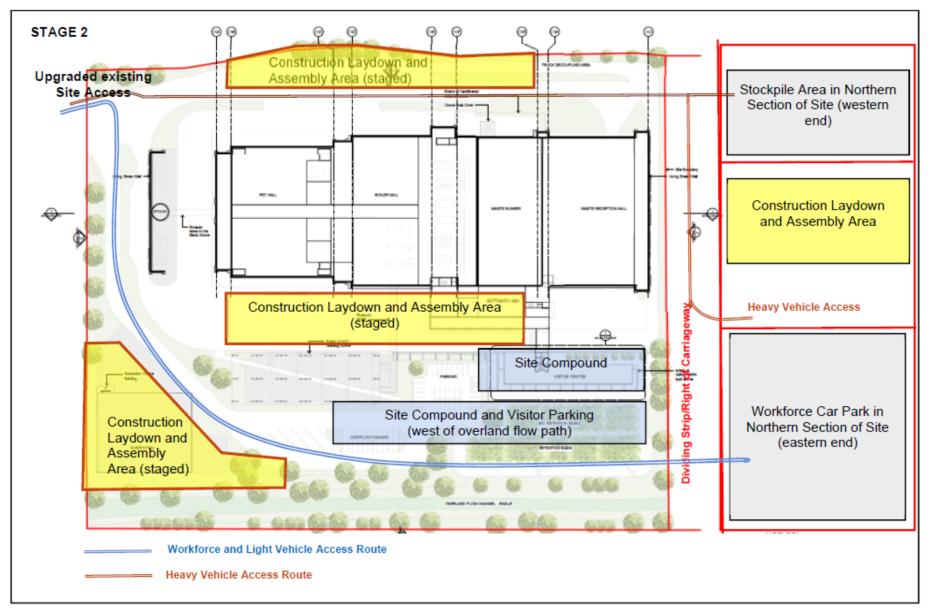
Indicative Site Layout Stage 2 (Main Construction)
